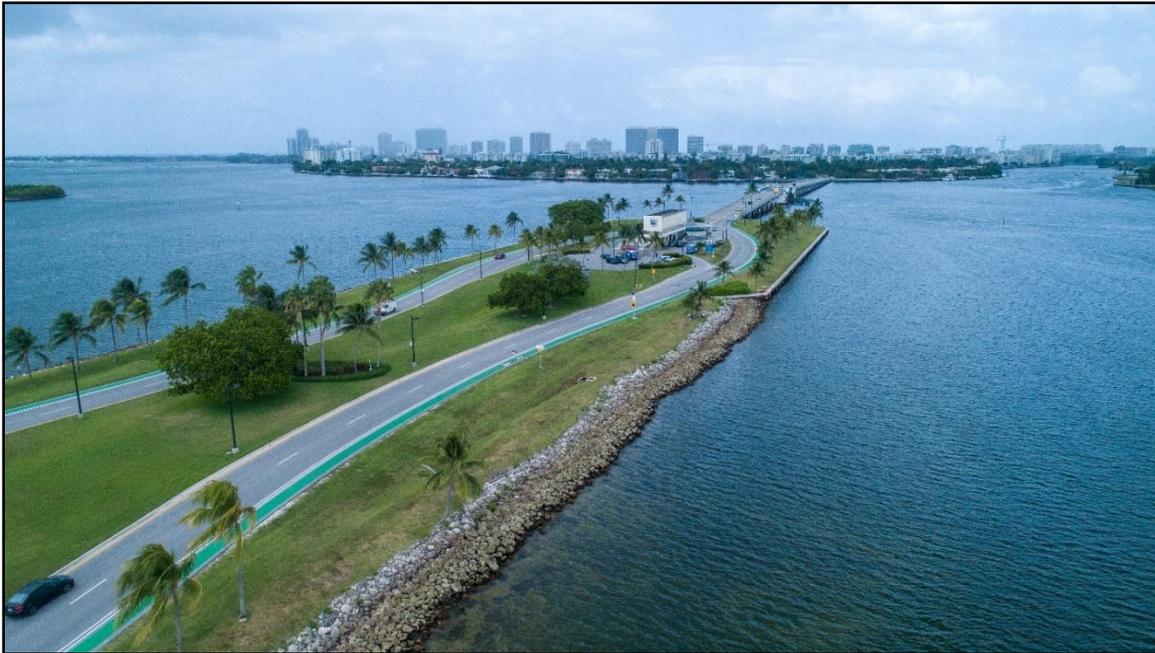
Aerial photo of the Broad Causeway Bridge from the southeast side of the bridge looking toward the east.
